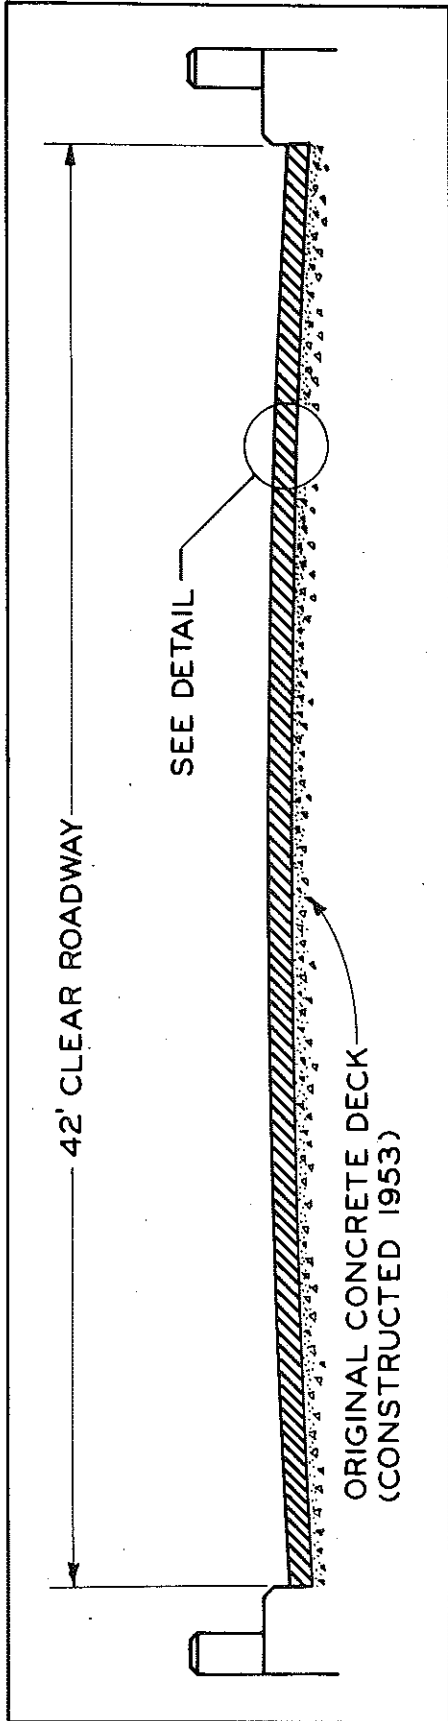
Typical proposed cross section of Gussasphalt waterproofing membrane.
